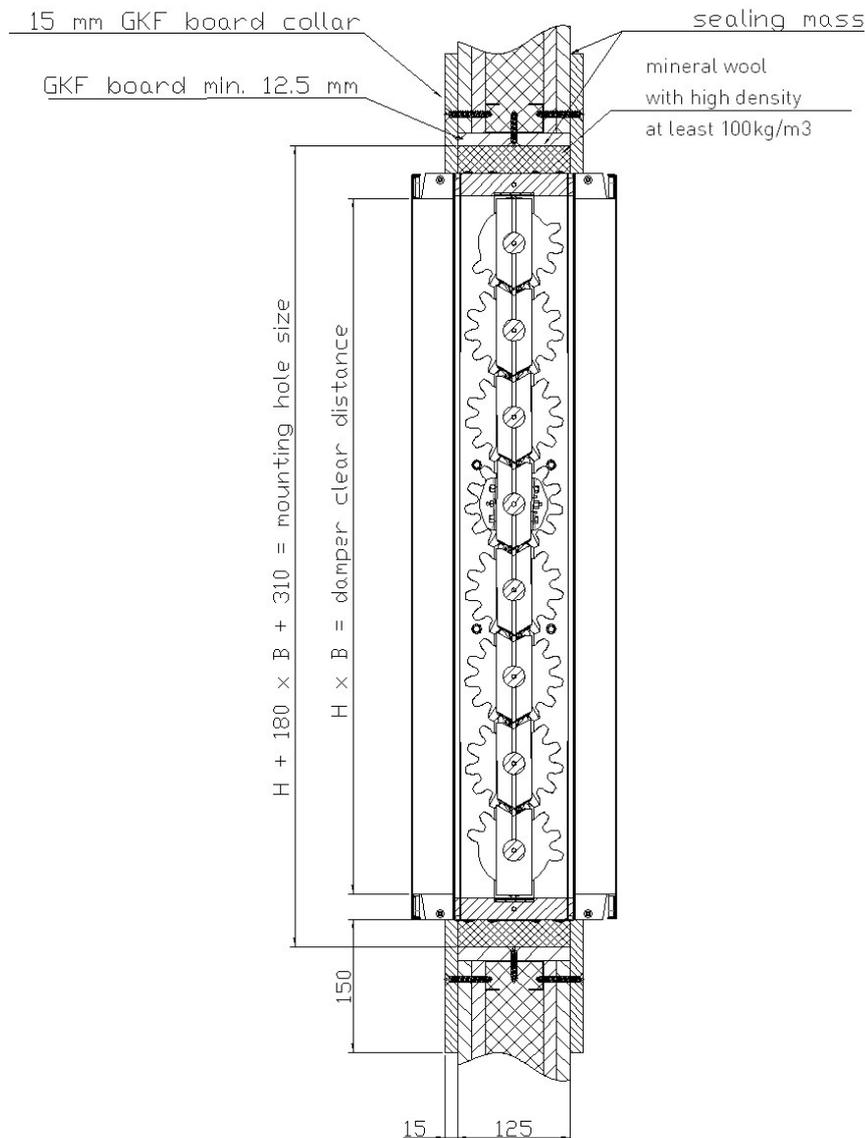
Installation method of fire dampers WKP-O in standard wall with 125 mm thick
